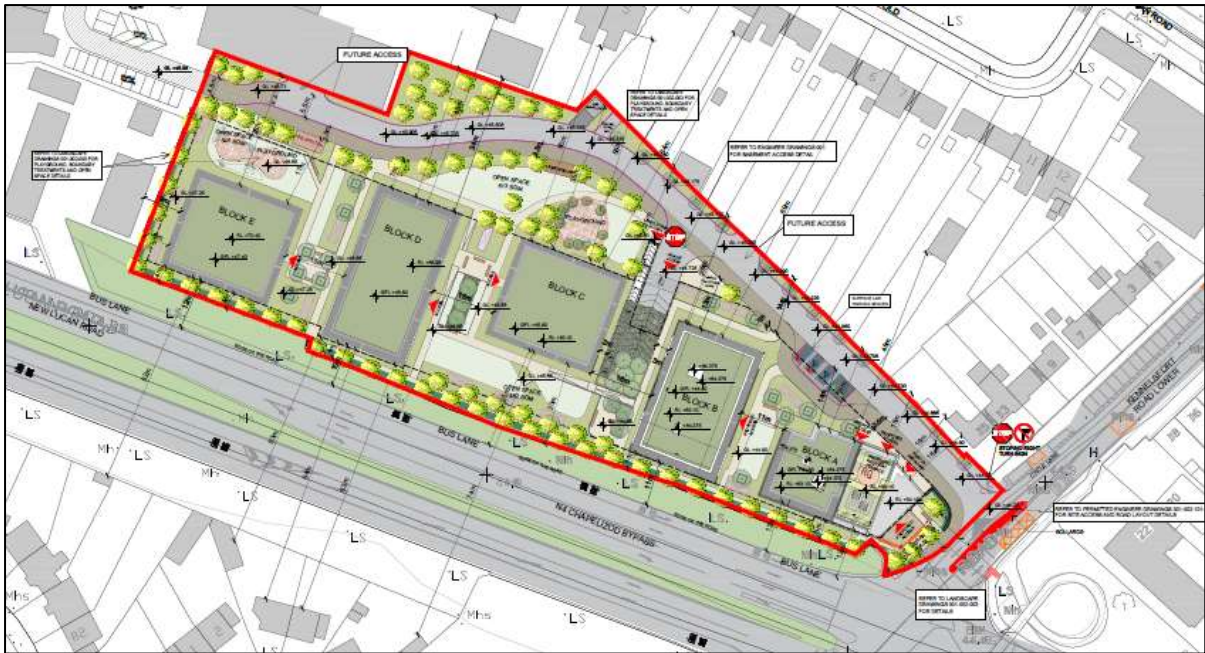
Permitted Site Layout Plan (ABP-309899-21)
